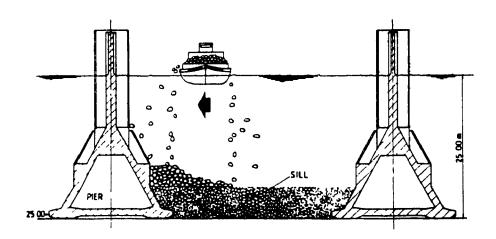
DUMPING SILL STONE WITH BARGES
